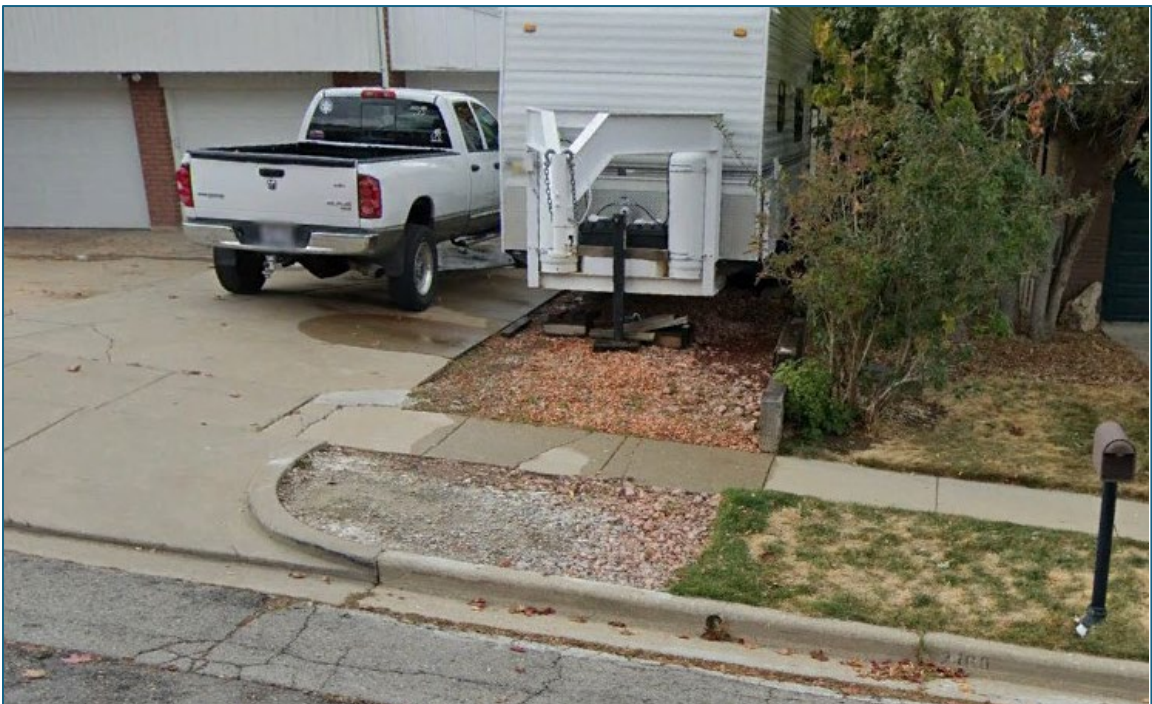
Sidewalk Damage at Expanded Parking
